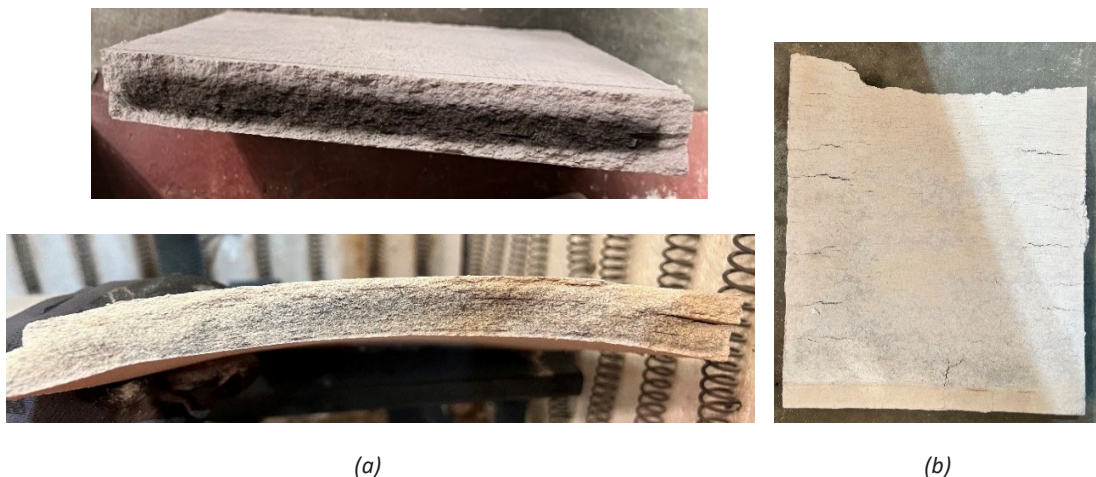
a) Burnt cross-section and bent specimen at failure at elevated temperatures (b) thermal cracks on the surface.
